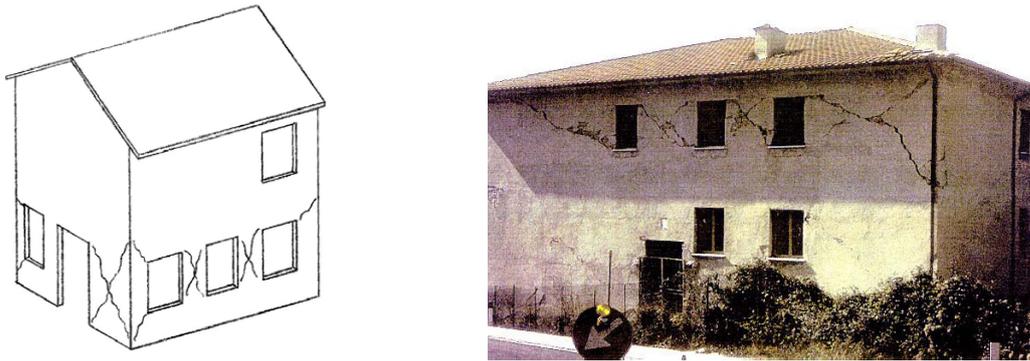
In plane mechanisms; Shear in masonry walls (Piers), (Franchetti, 2008)
